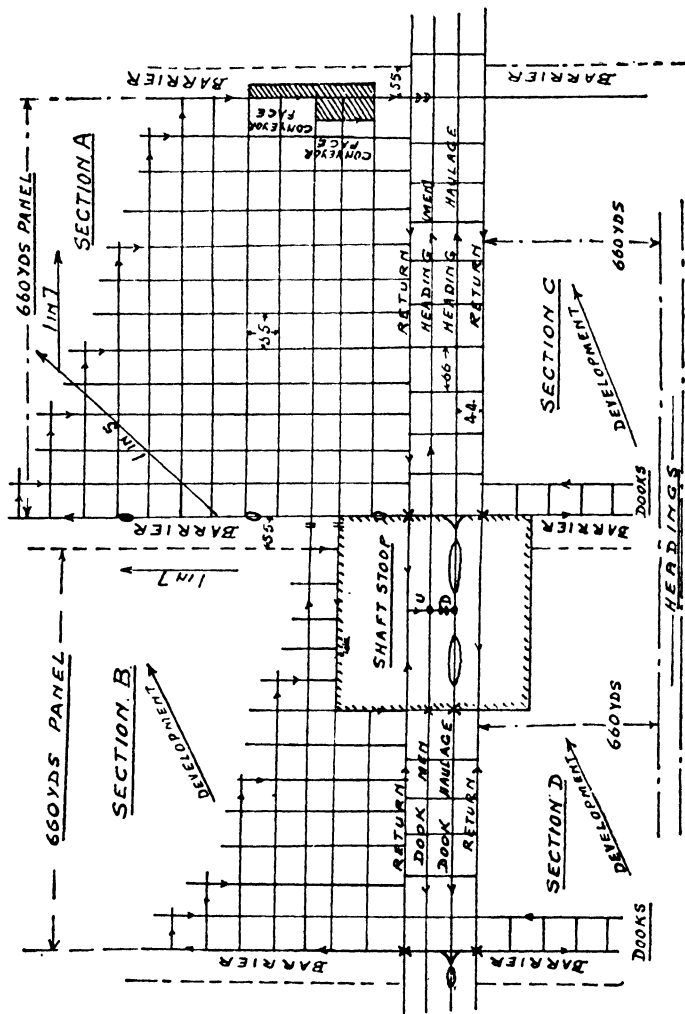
Plan showing Design of Pillar-and-Stall Workings.
